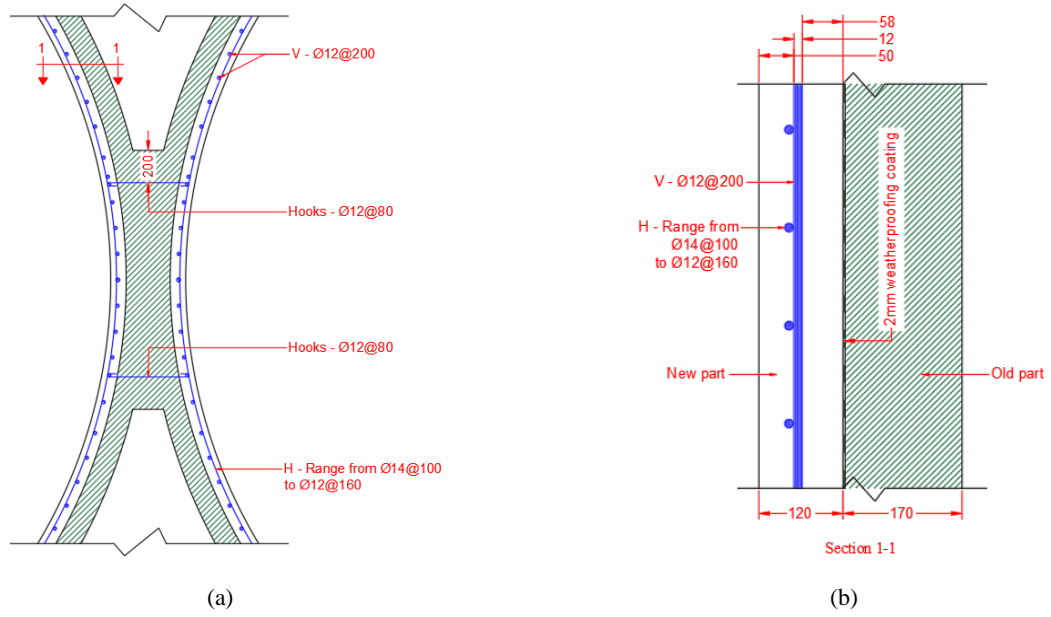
a) Silos walls' reinforcement after rehabilitation (mm) b) Section 1-1 for the silo's wall (mm)
